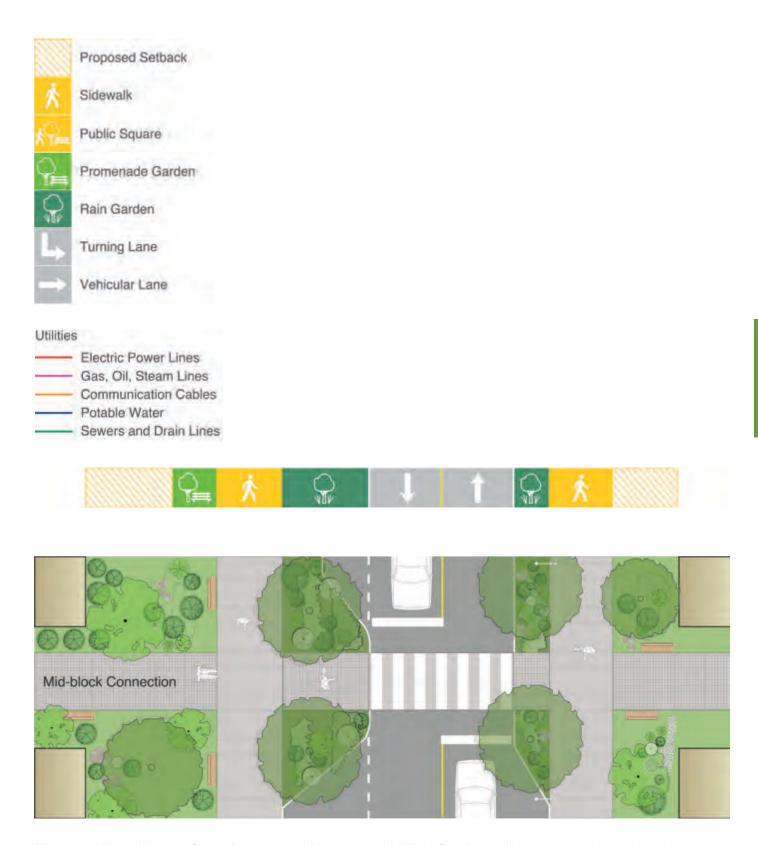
Plan of Merton Street Promenade - Recommended Final Condition of bump-out and raised crossing at mid-block connection
